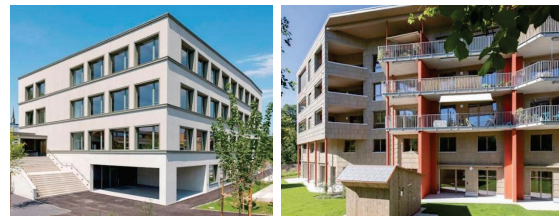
Buildings showing the recent trend in modern architectural design towards façade walls with large openings. [4]
